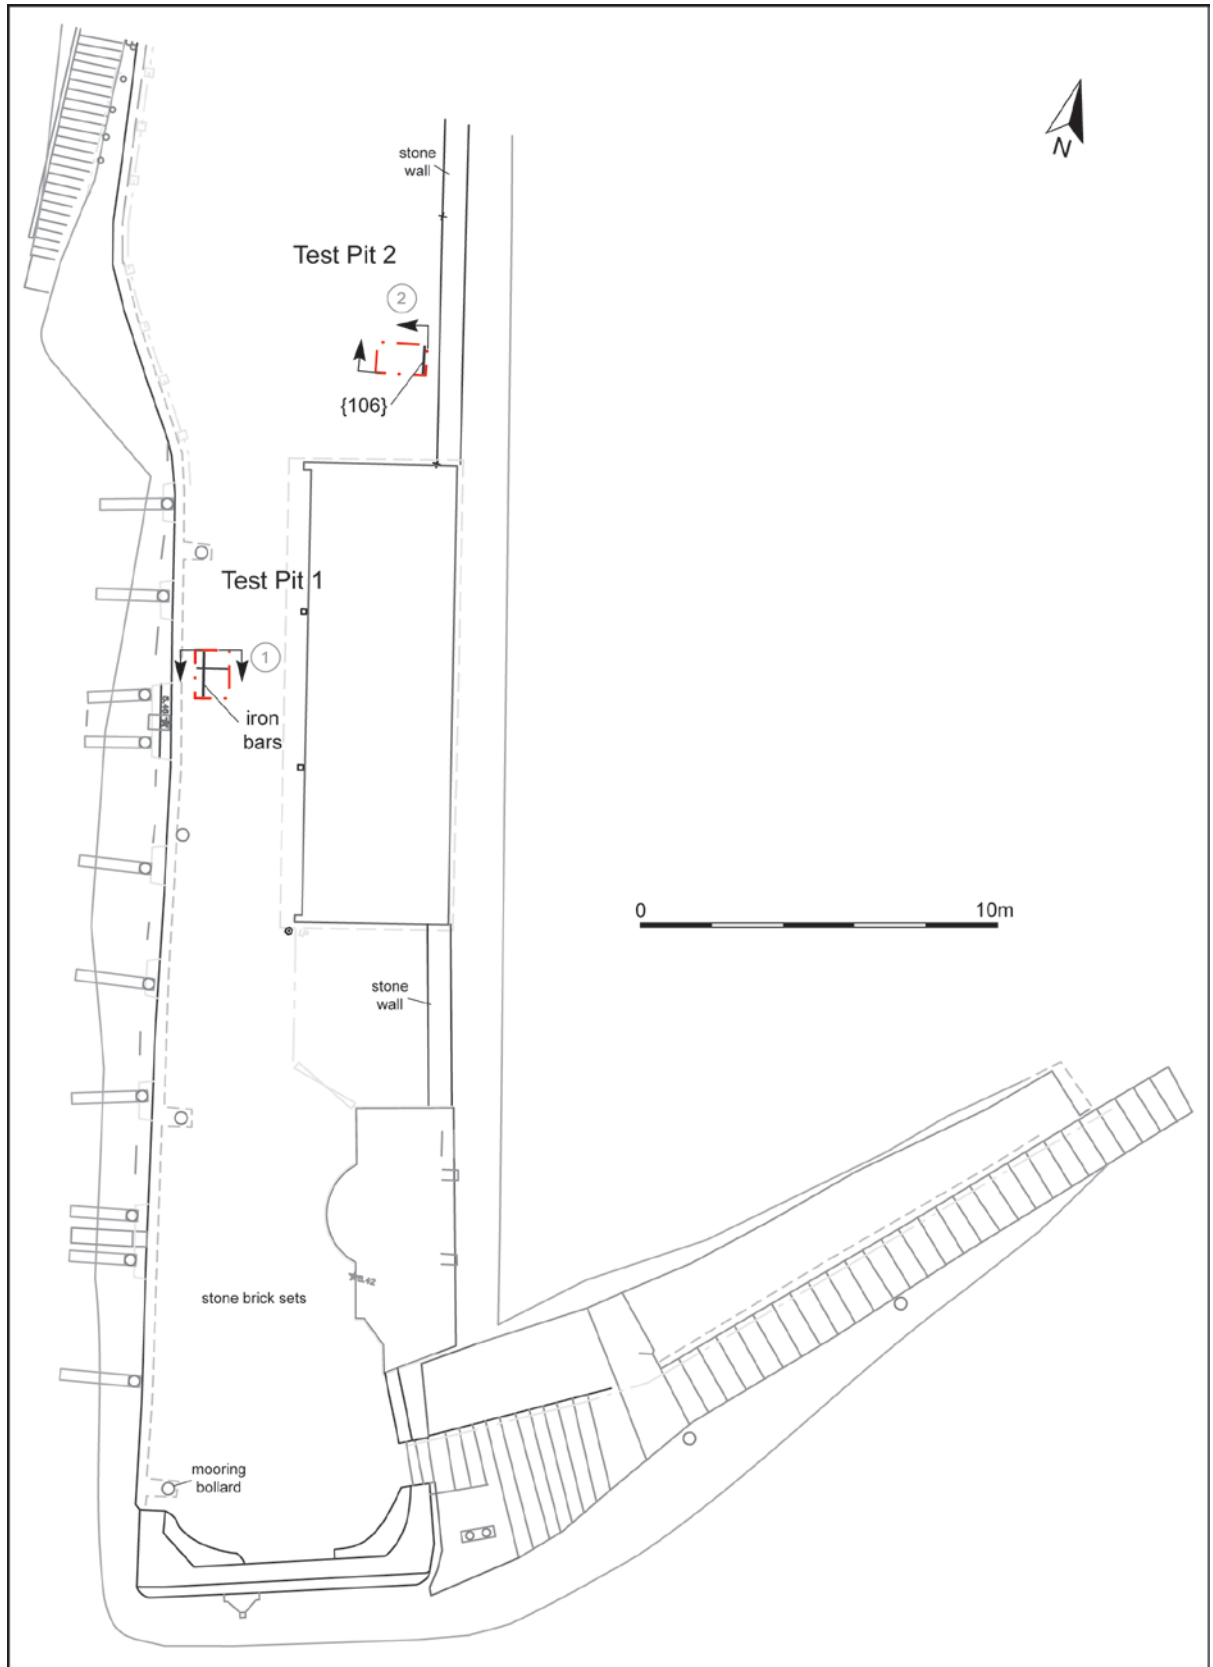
Plan of test pits, grey scale numbers correspond to section numbers in Figure 9.
